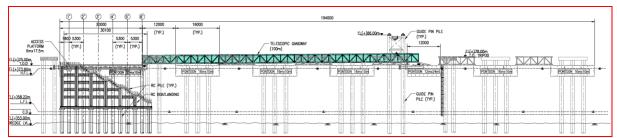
Longitudinal section of Berthing facility at High Flood level (+) 73.9m CD
